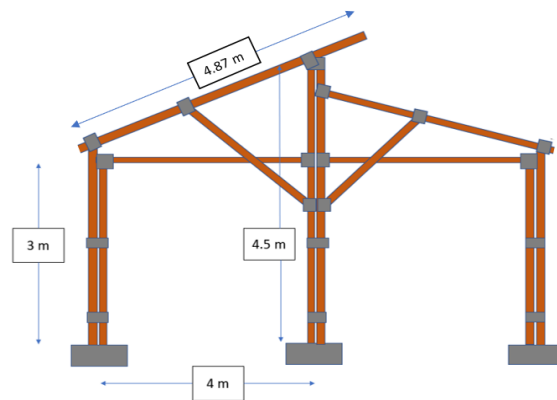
(b): Sectional view of modified bamboo polyhouse structure
